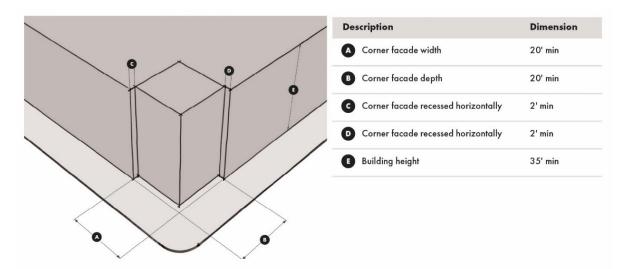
AA: CORNER POPPED OUT FROM REST OF FAÇADE
